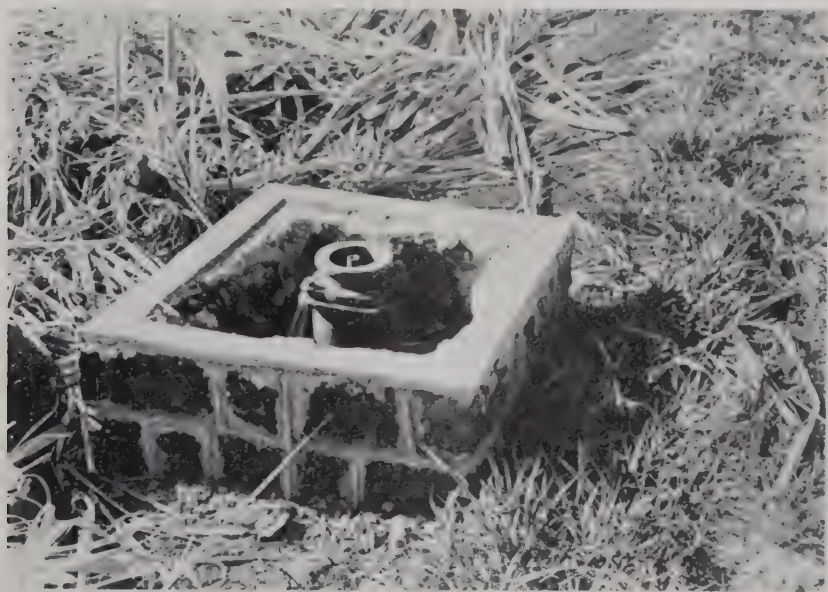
Plate II. A hydrant from the underground "main", showing the protective masonry wall. This has been found necessary to avoid damage to the hydrant.
